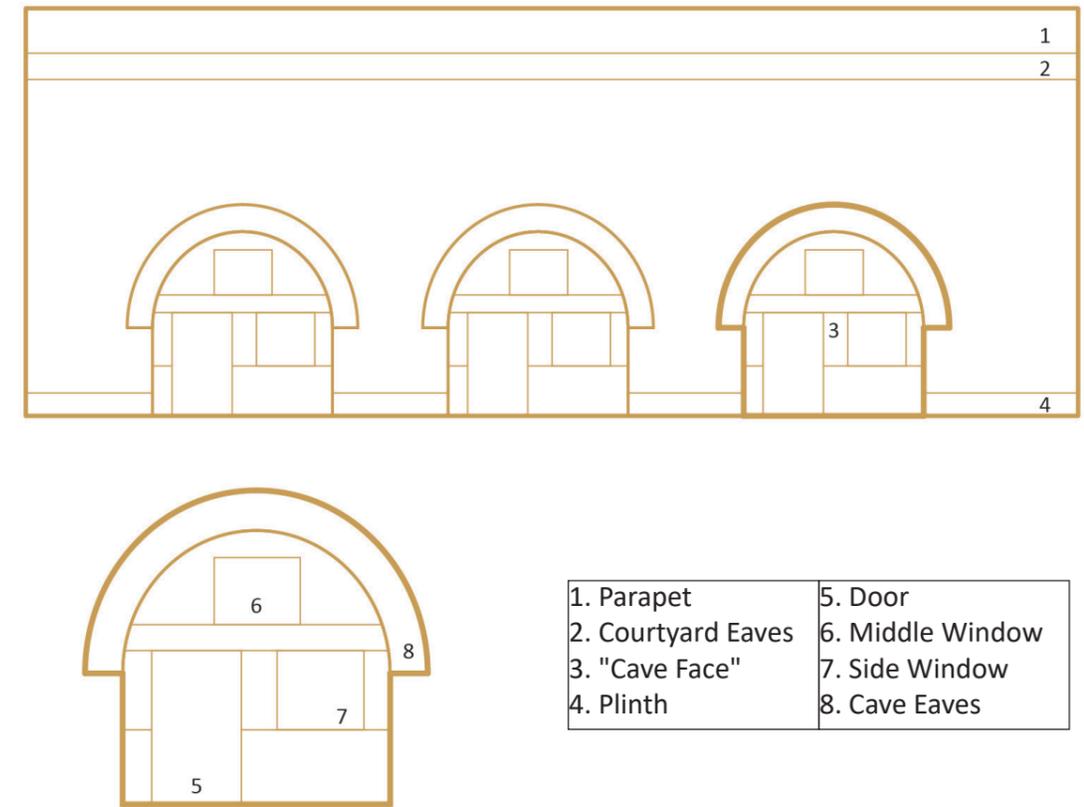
Facade elements of a typical Dikengyuan (pit courtyard). Drawn by the author.
